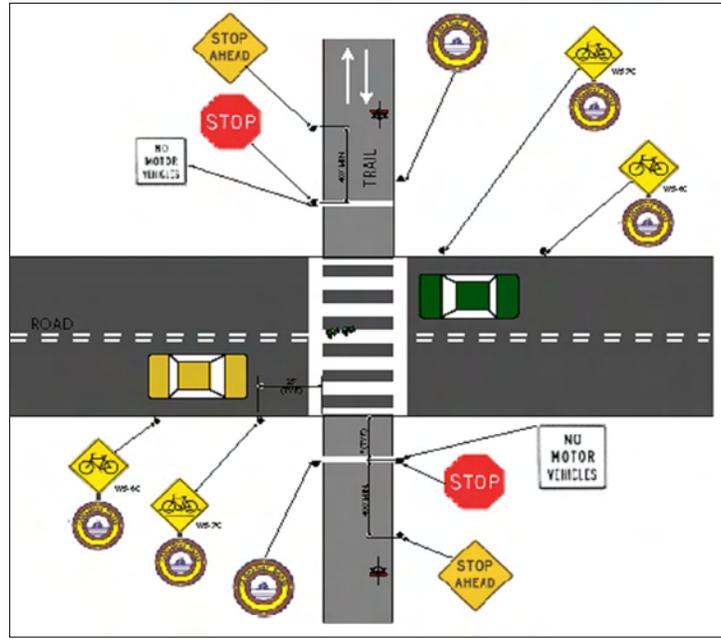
K – Typical Signs and Pavement at Rural, Unprotected Trail Crossing
